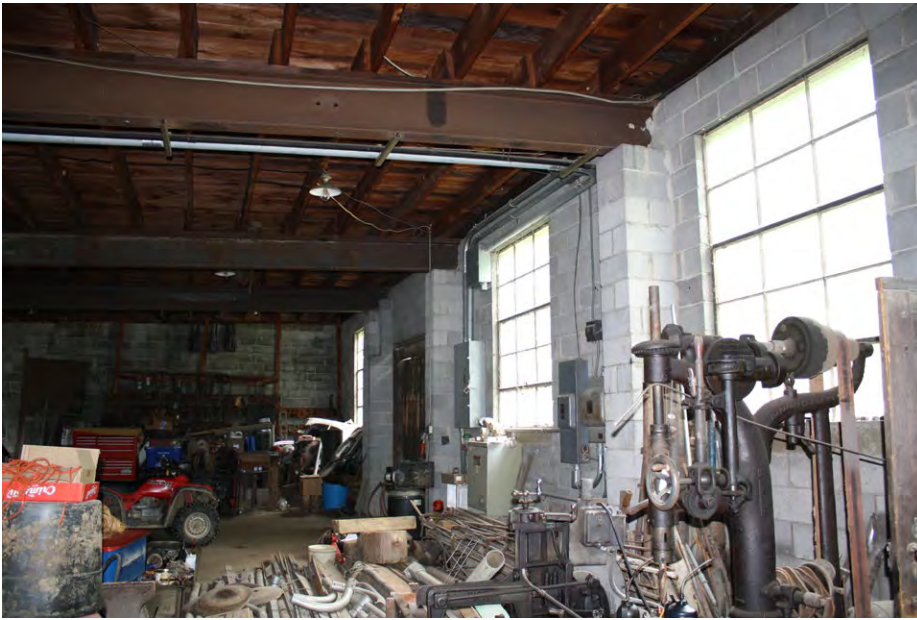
Machine Shop interior showing I-beams and wood roof decking.
